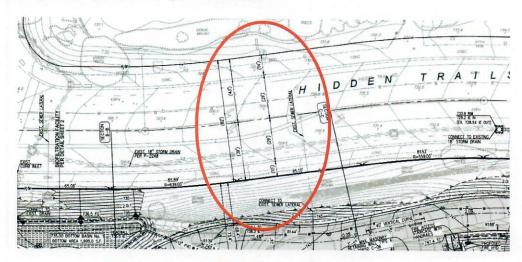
HIDDEN TRAILS ROAD SECTION
